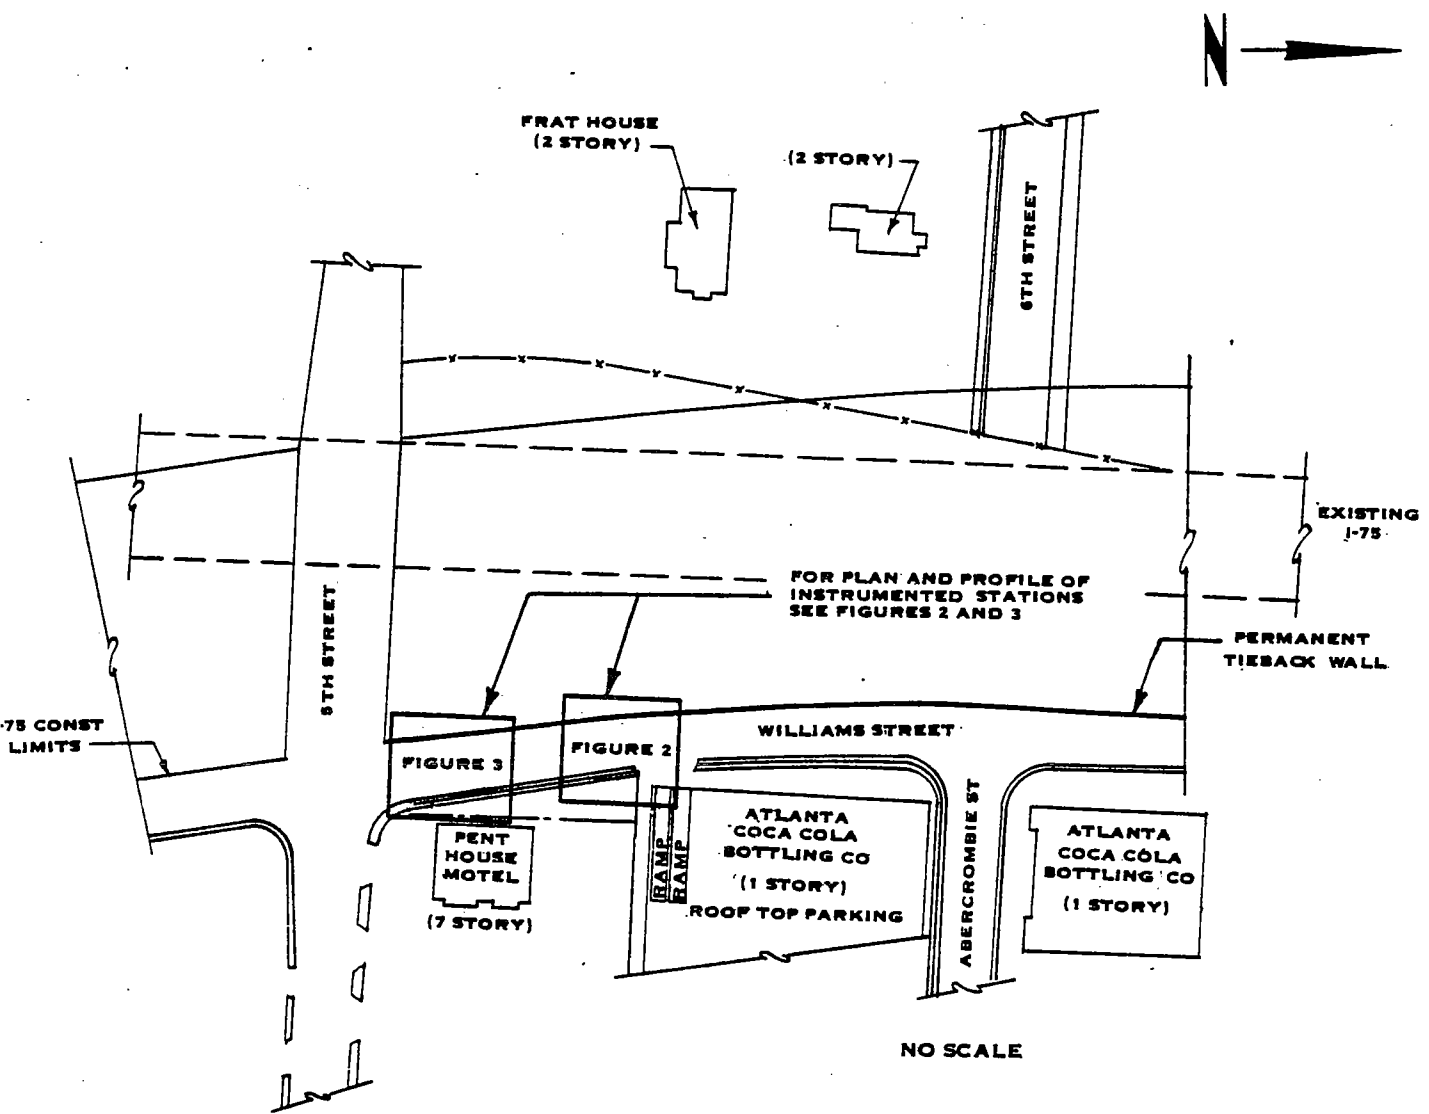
SITE PLAN OF GEORGIA DEPARTMENT OF TRANSPORTATION
